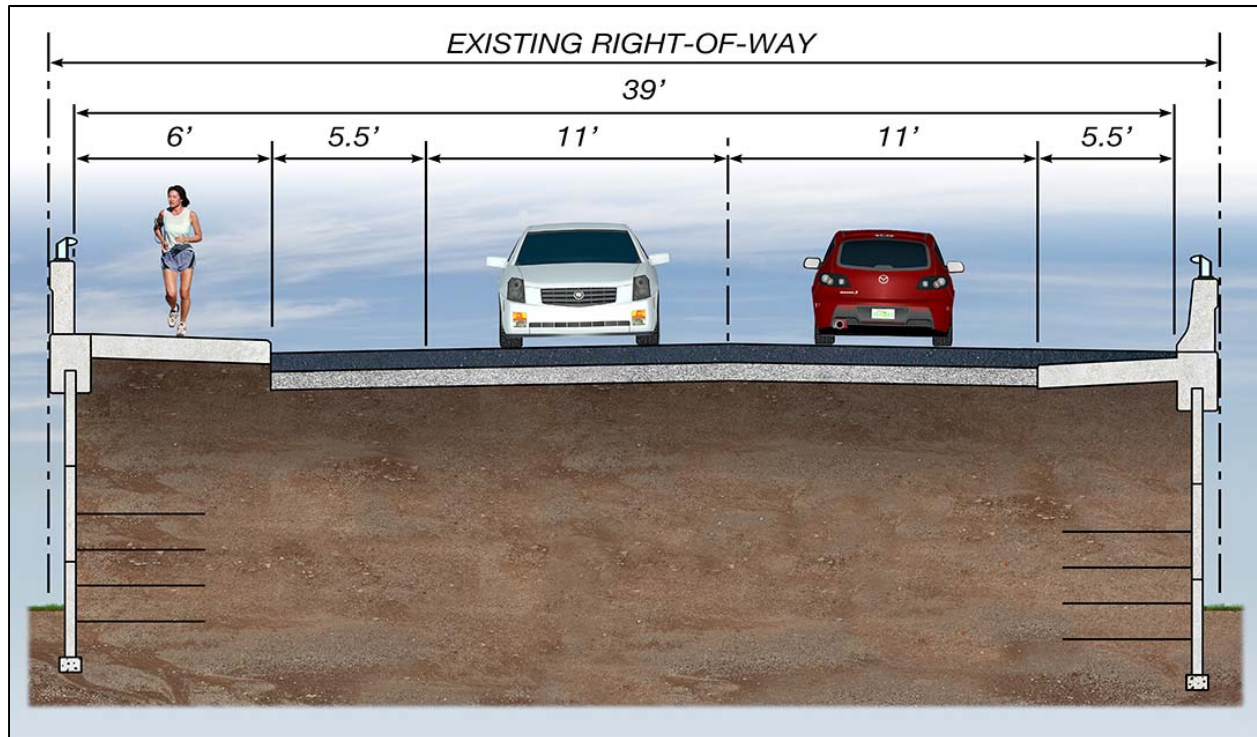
Proposed Roadway Section East of Proposed Fixed Bridge
